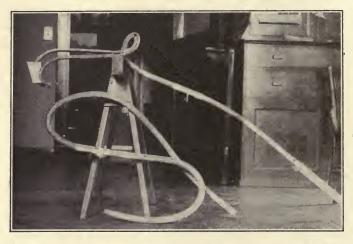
UPPER BAR: REROLLED STEEL, IMPROPERLY MANU-FACTURED. LOWER BAR: GOOD SPECIMEN.
